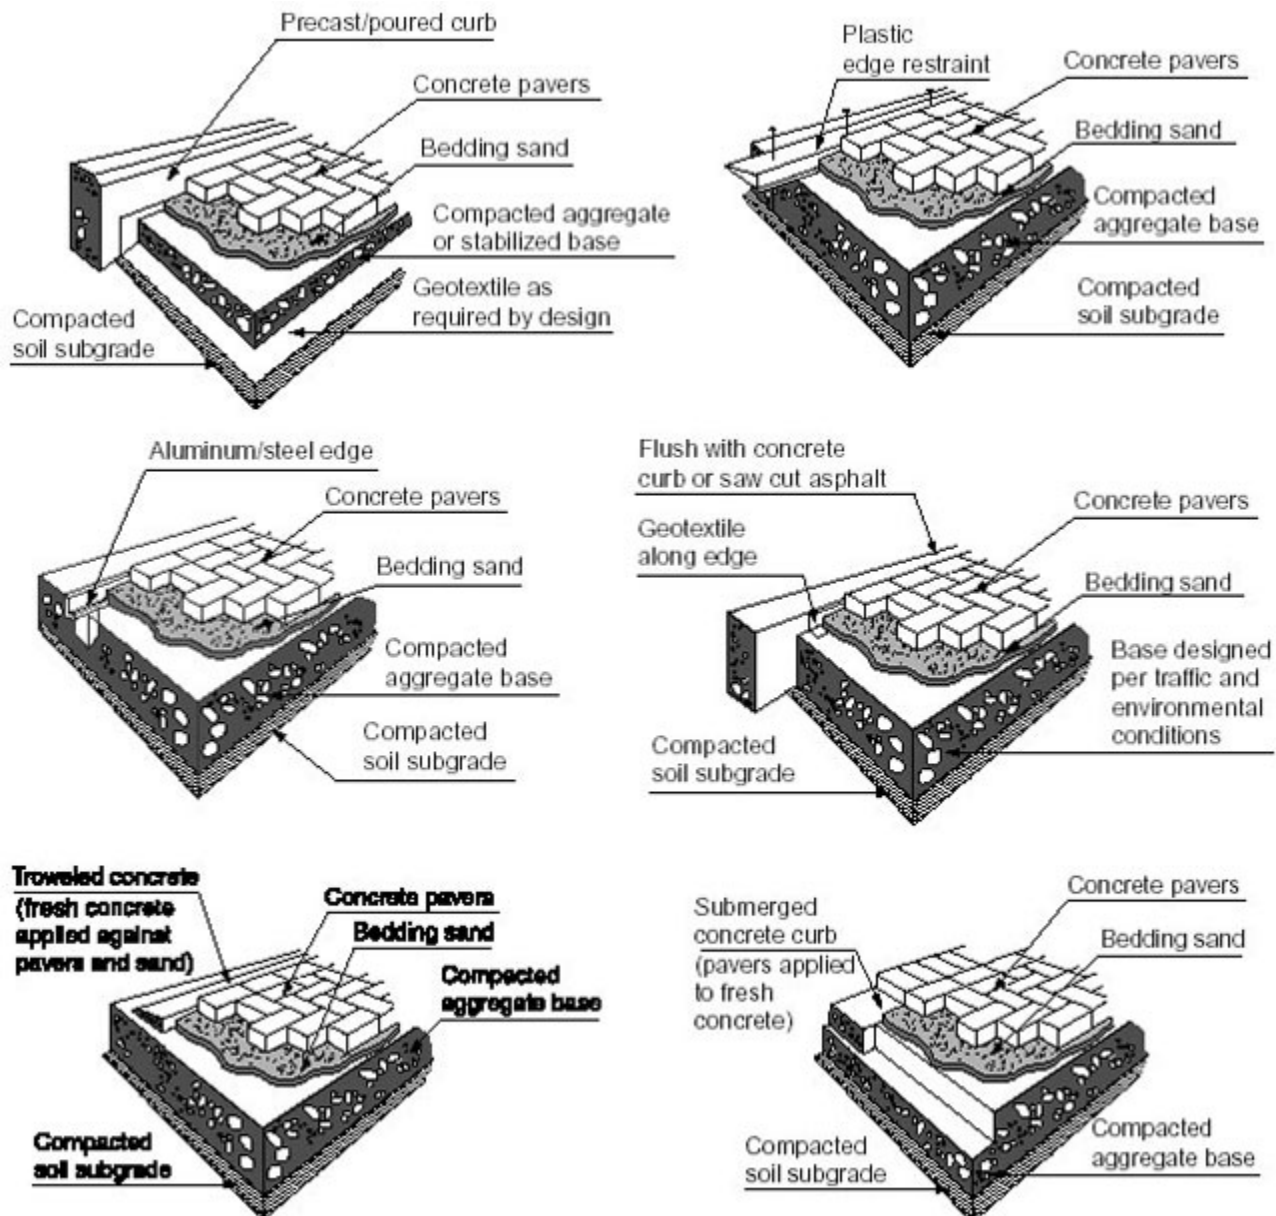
Edge Restraints. Note: Troweled concrete and submerged concrete curbs are recommended in non-freeze thaw areas only.
